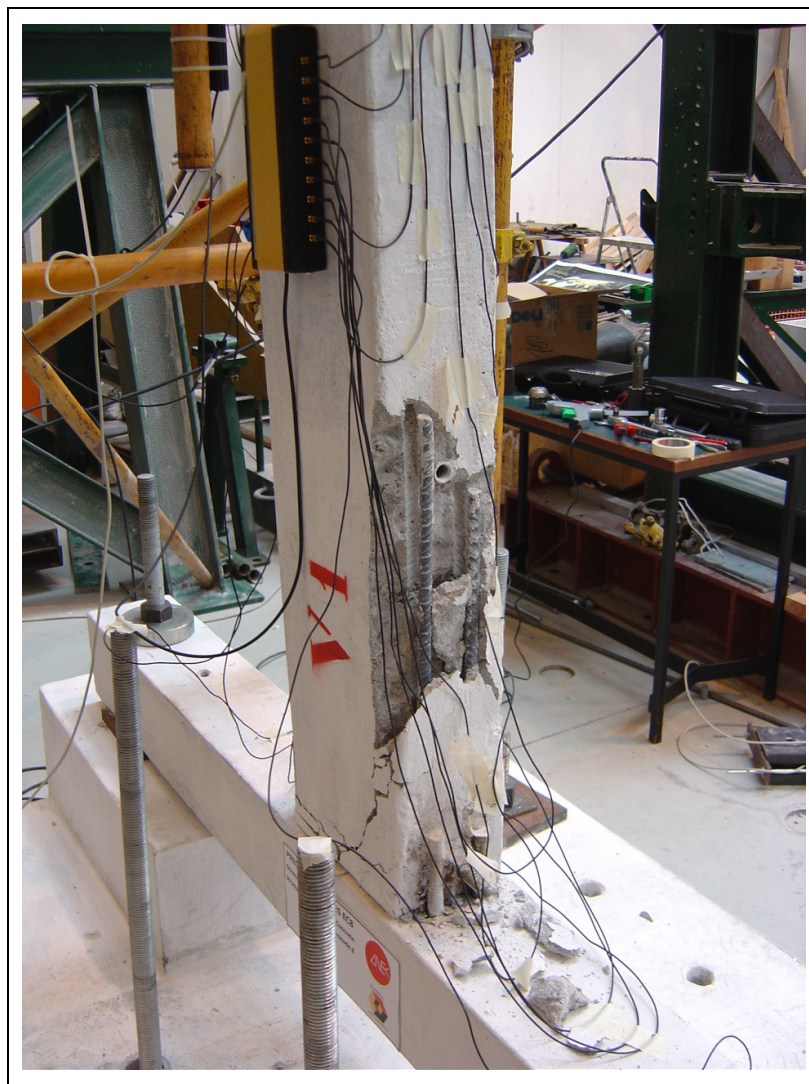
Specimen V1 – Cover spalling due to non-confined reinforcements.
